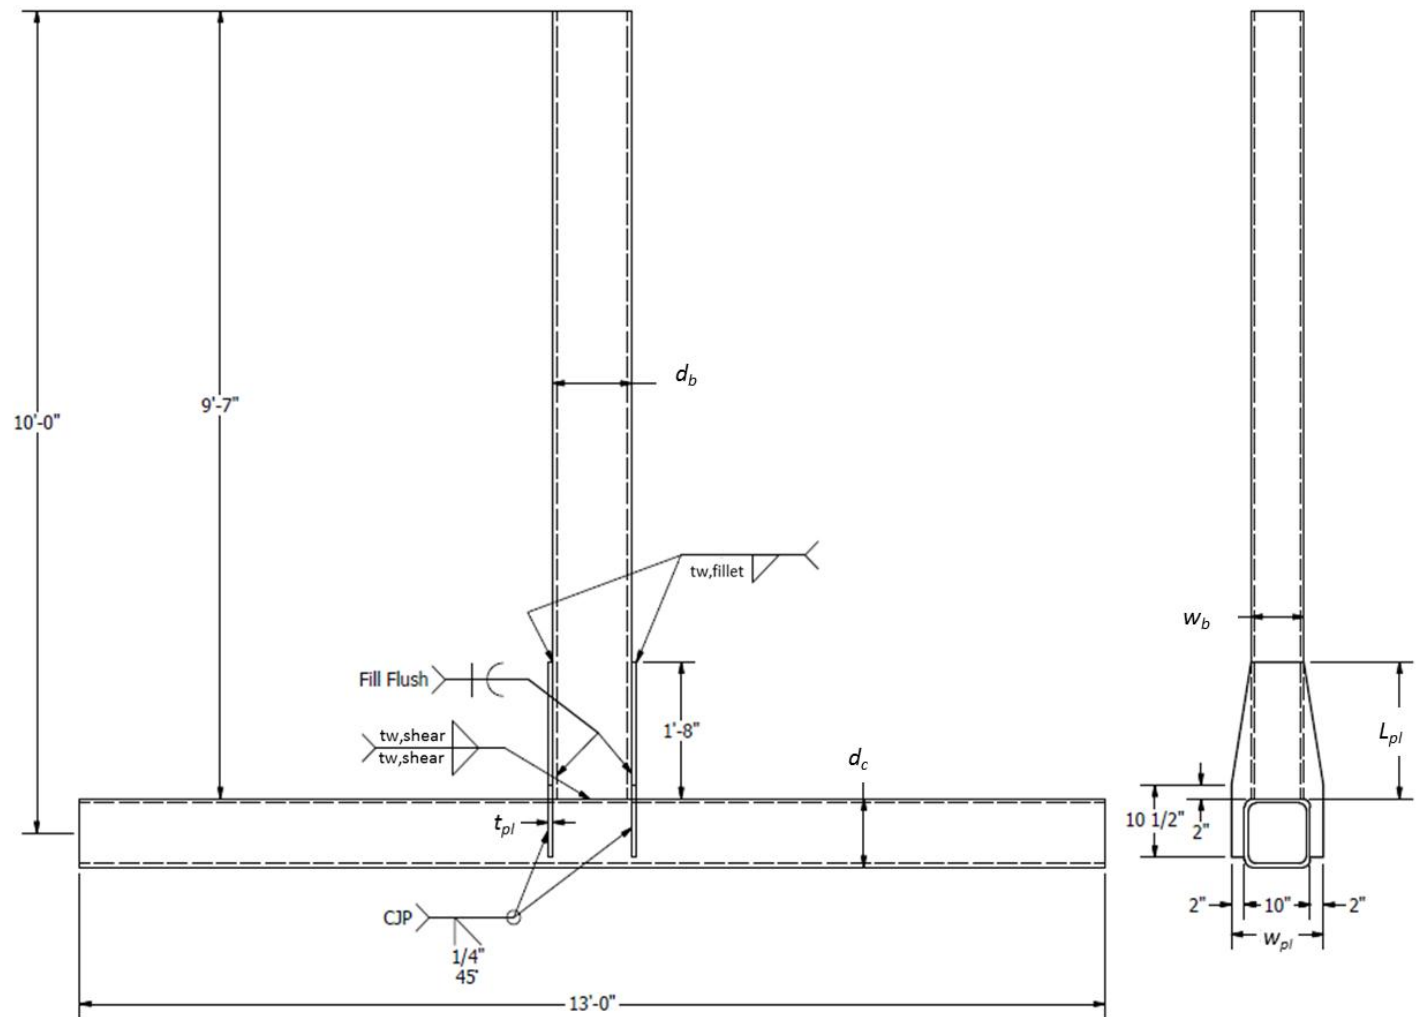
Typical external diaphragm plate HSS-to-HSS moment connection
